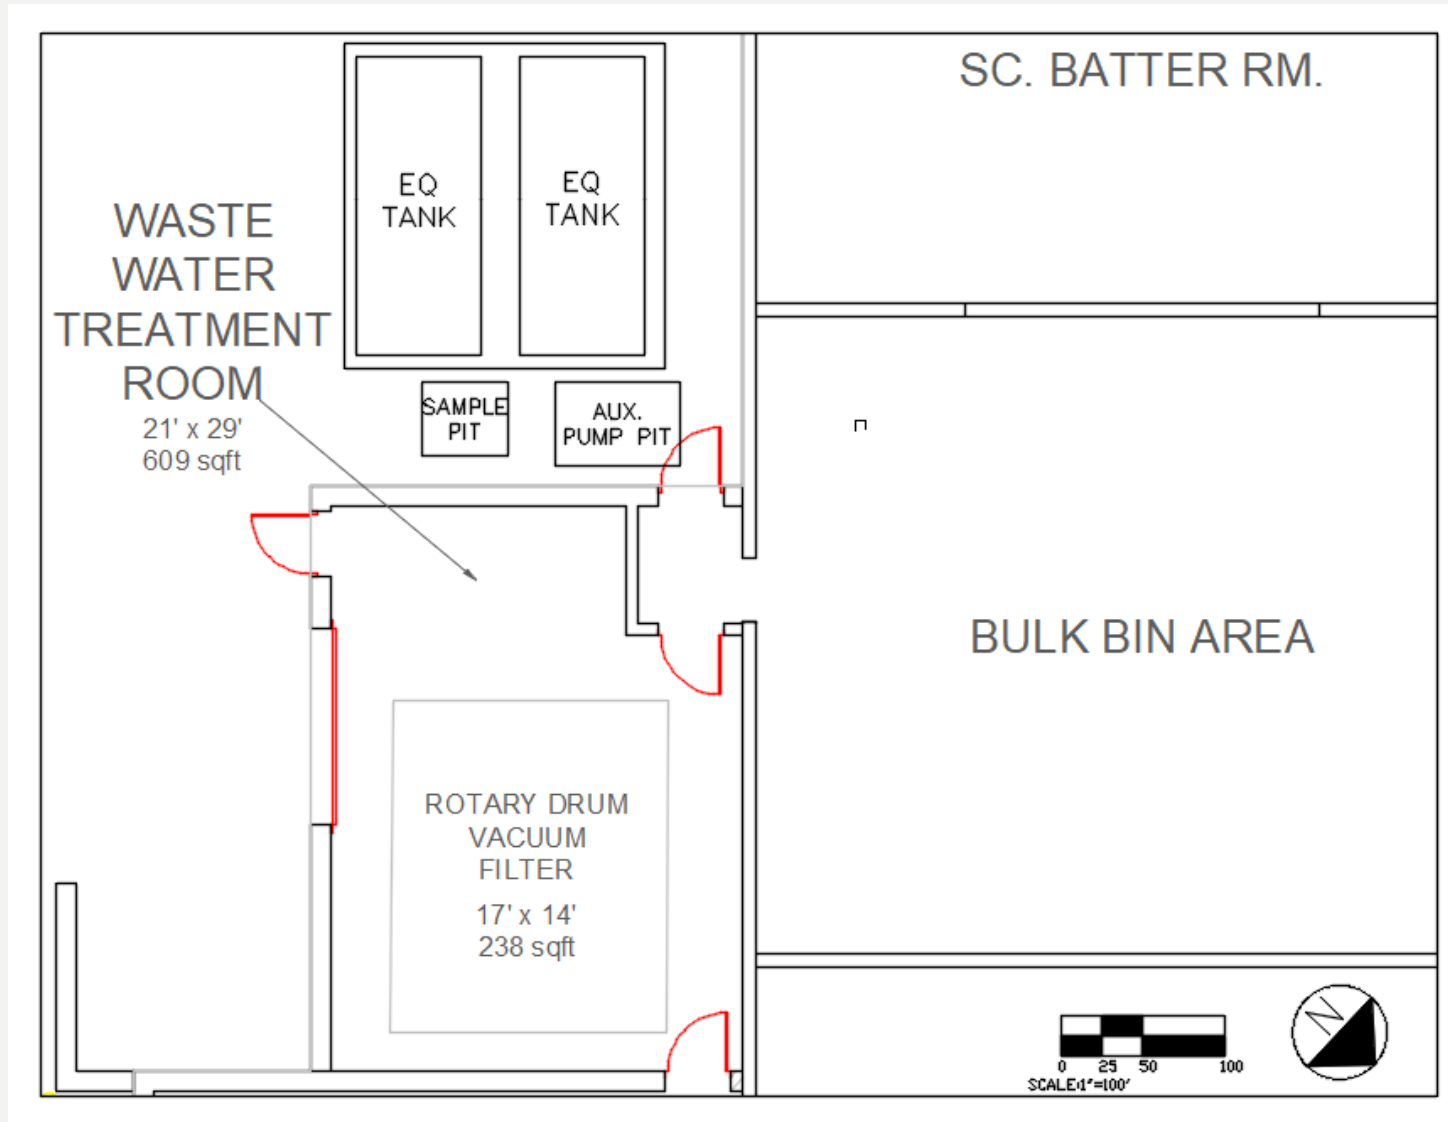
Plan View of Current Treatment Room at Joy Cone Co.
